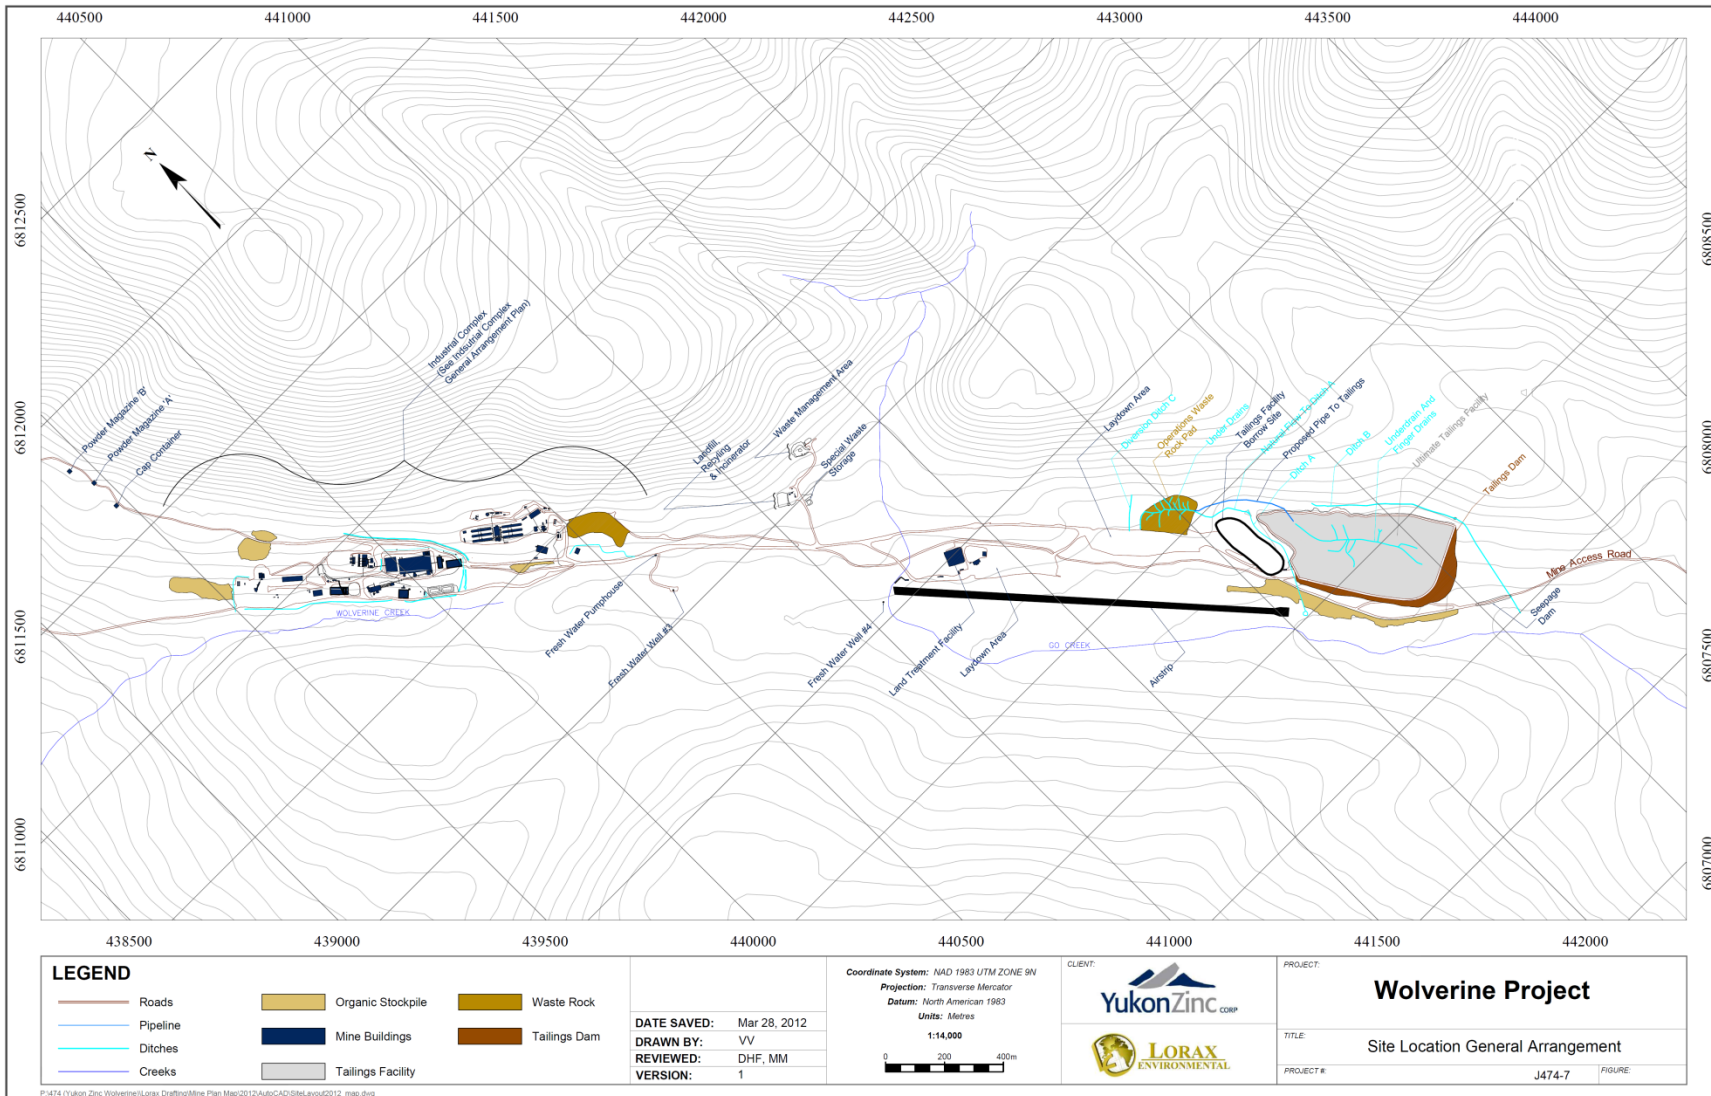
Wolverine Mine General Site Plan End of 2011
